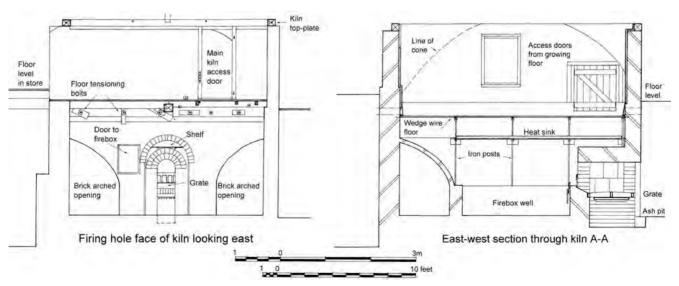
Halstead, Adams Brewery, elevation of, and section through, the malting kiln
